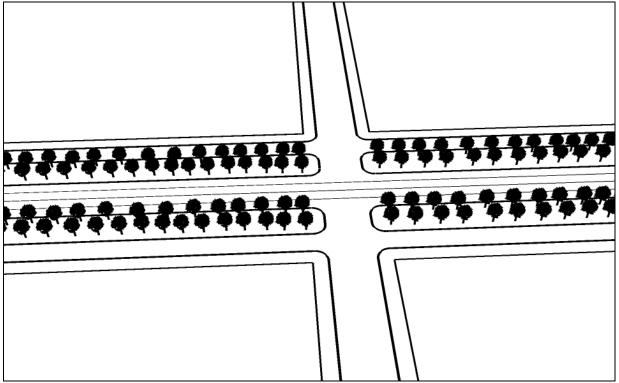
The median curb and gutter and one-way access lanes are added, creating the basic block structure of the town center multiway boulevard
